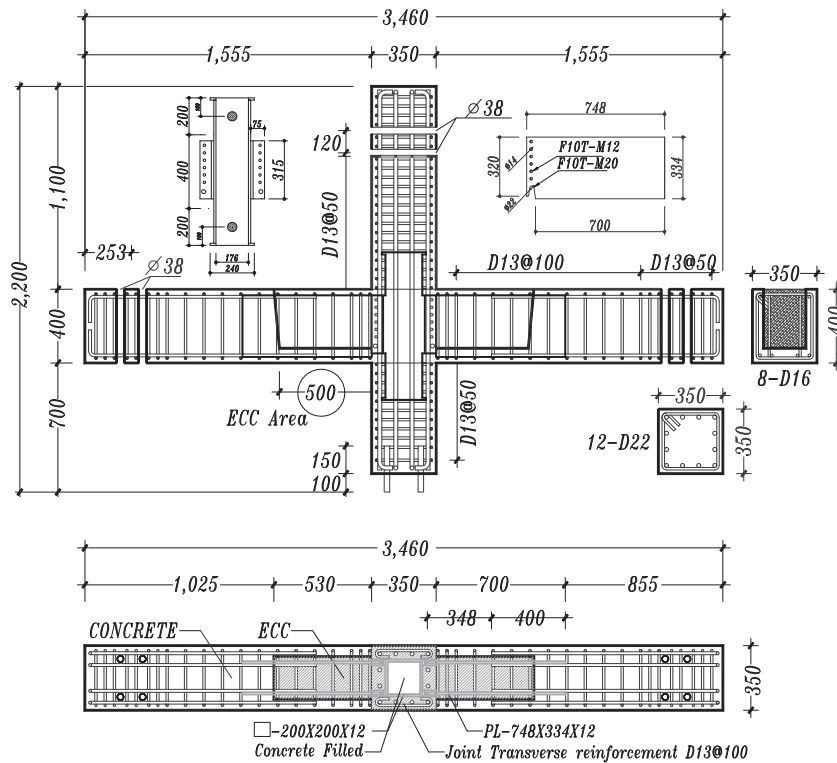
Details of PC-IH-50 Specimen (Unit: mm).
